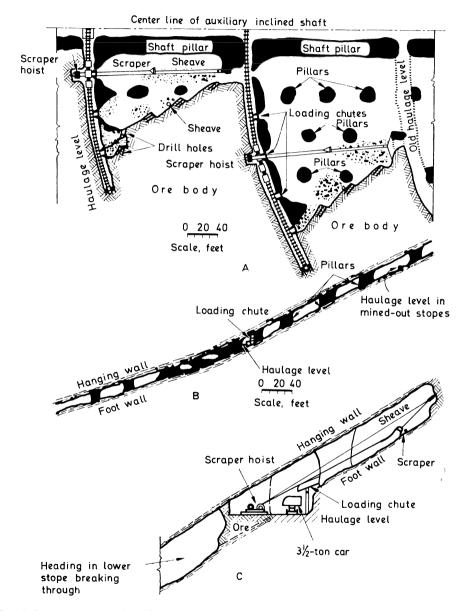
Scraper stopes, Mineville, N.Y., (A) Plan of a stope. (B) Cross-section through stope. (C) Enlarged cross-section showing scraping to chute.⁽⁸⁾
